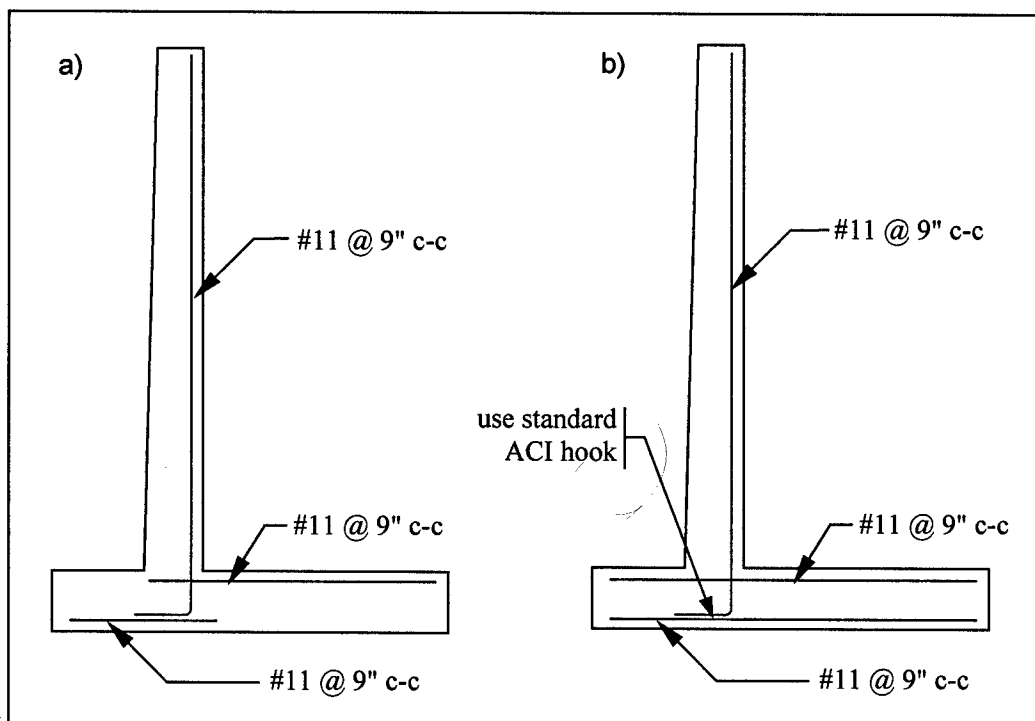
Proposed steel reinforcement detailing. A minimum 4" cover is required
